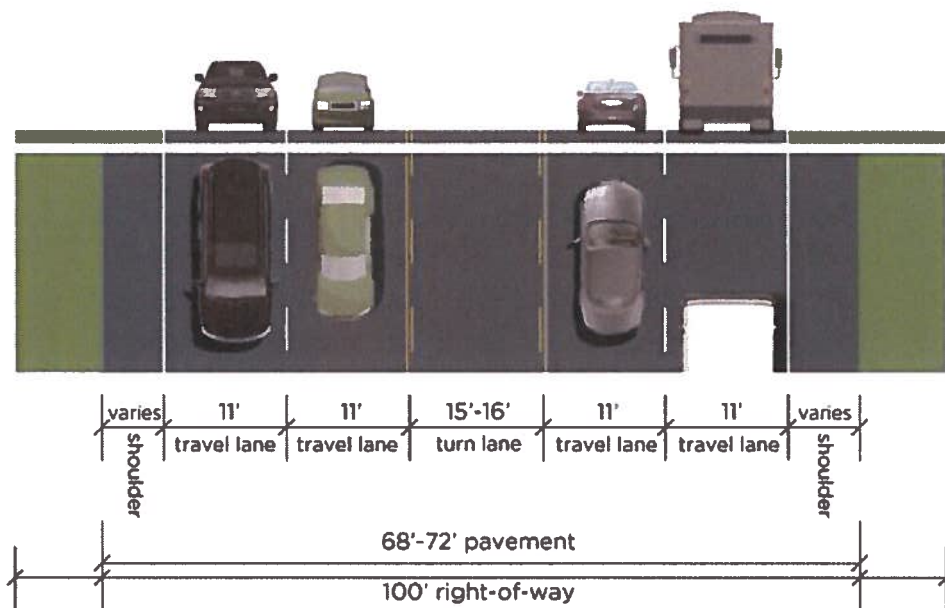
Existing middle/business area segment - existing 68'-72' pavement width
